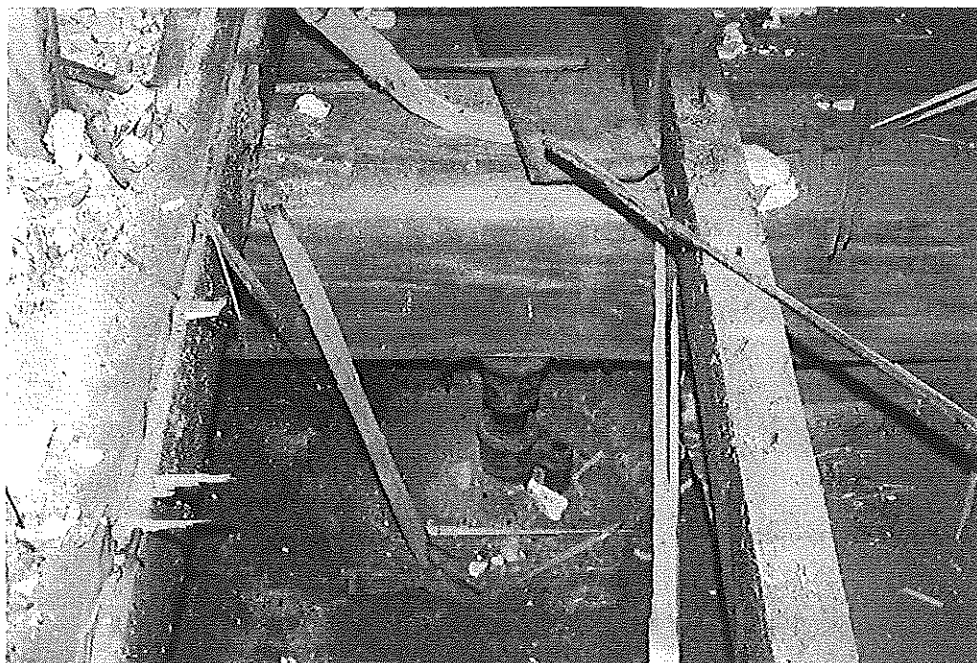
at Dining Room floor, looking south: hewn transverse beam and old jack
